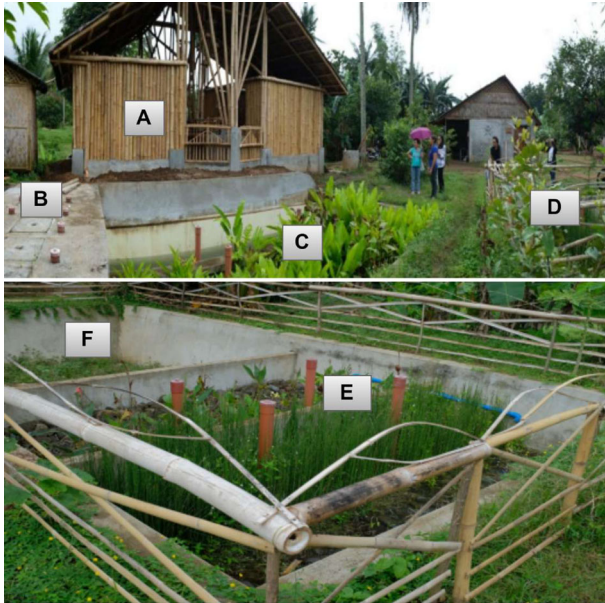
Wastewater treatment facility at LP4Y, Calauan, Laguna: (a) toilets and showers, (b) ABR, (c) vertical subsurface flow constructed wetland with *Heliconia* sp., (d & e) 2-stage horizontal sub-surface flow constructed wetlands with horsetail and canna lily, and (F) polishing pond. [Color figure can be viewed at wileyonlinelibrary.com]
